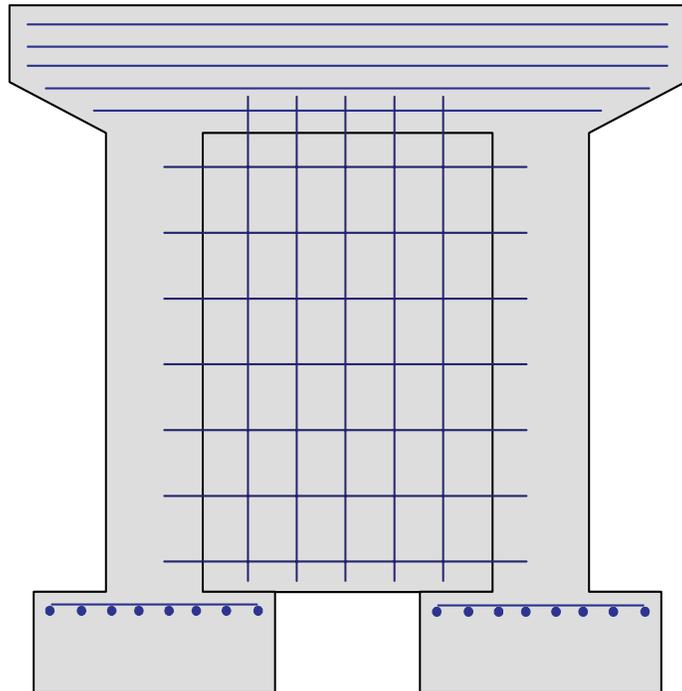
Secondary Reinforcement in Column Bent with Web Wall
